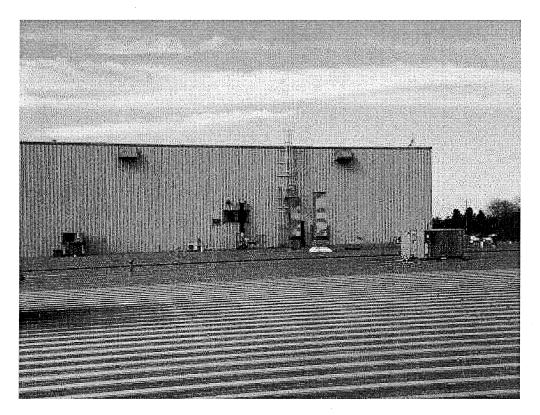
(Roof photo) : Roof photo looking towards building that houses the melt furnaces. A small bag house is located next to the door and is partially obscured.
